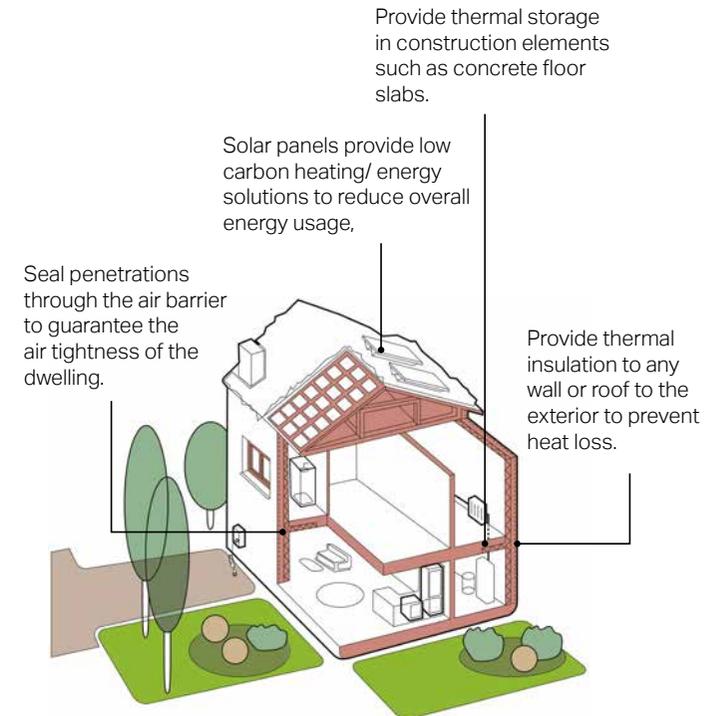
Diagram illustrating some aspects of the building fabric to be considered.
